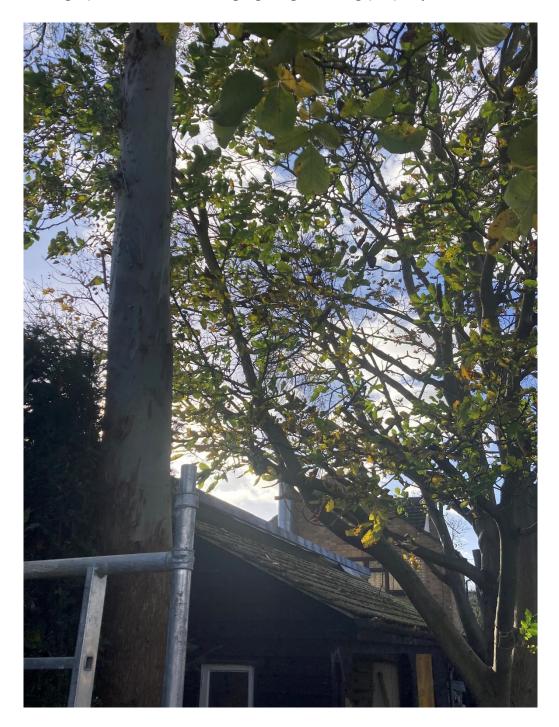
Proximity of trees to outbuilding and lean on walnut
